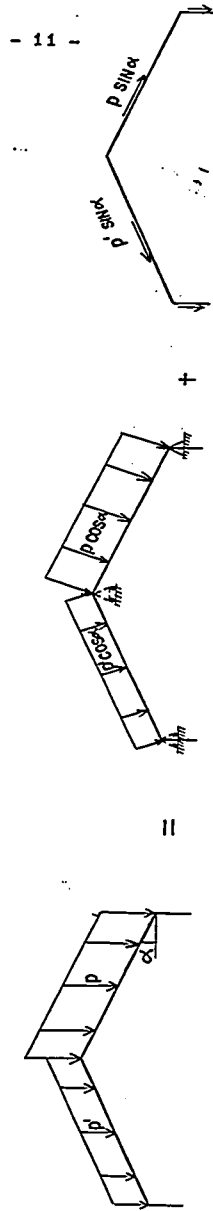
SLAB AND PLATE ACTION OF THE FOLDED PLATE
